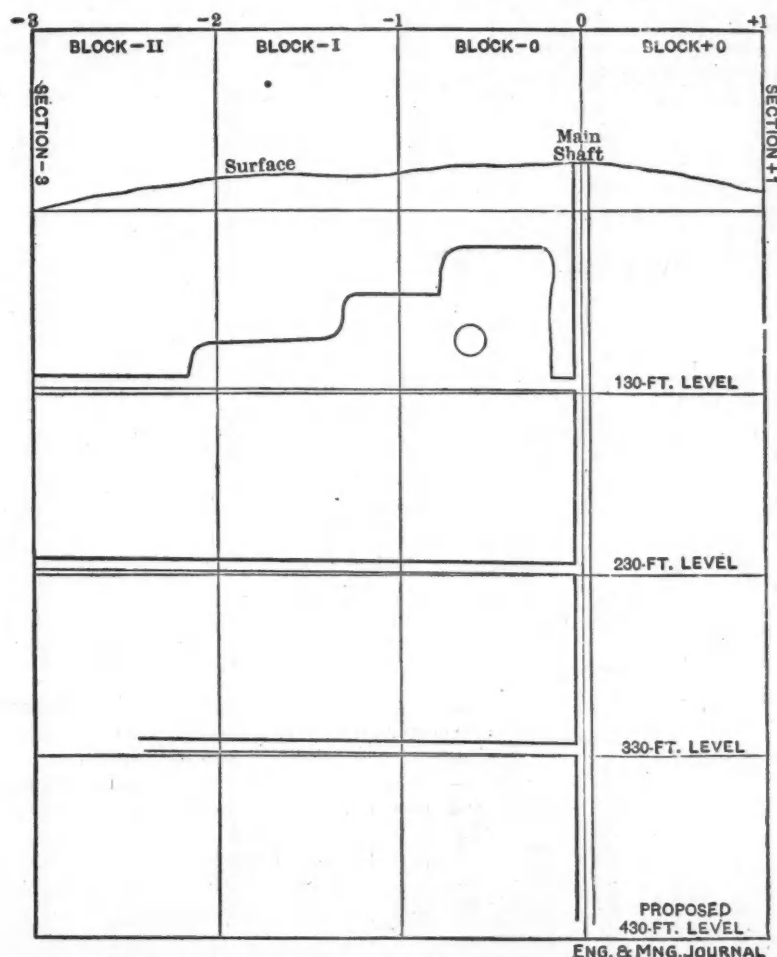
IDEAL LONGITUDINAL ELEVATION OF A MINE.
